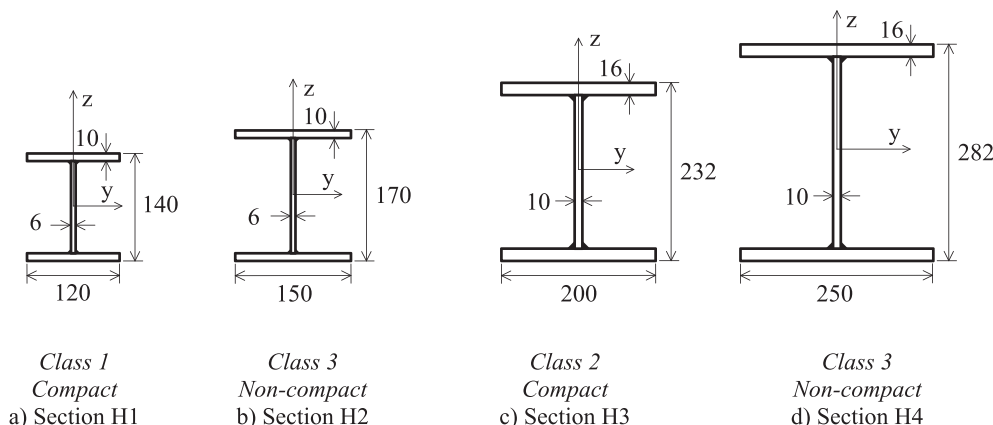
Nominal cross-sectional dimensions of welded H-sections.
